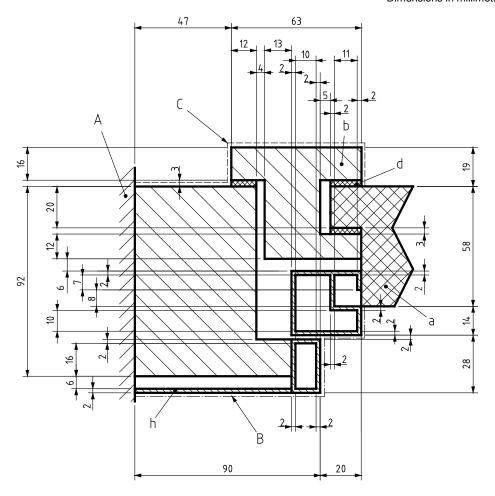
Aluminium clad wood frame section and insulation panel ($b_{\rm f}$ = 110 mm)
